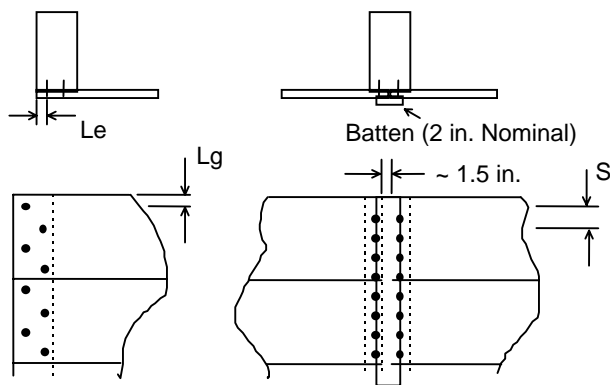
Glued-laminated horizontal nailed connection. Nominal 2 in. = standard 38 mm.
